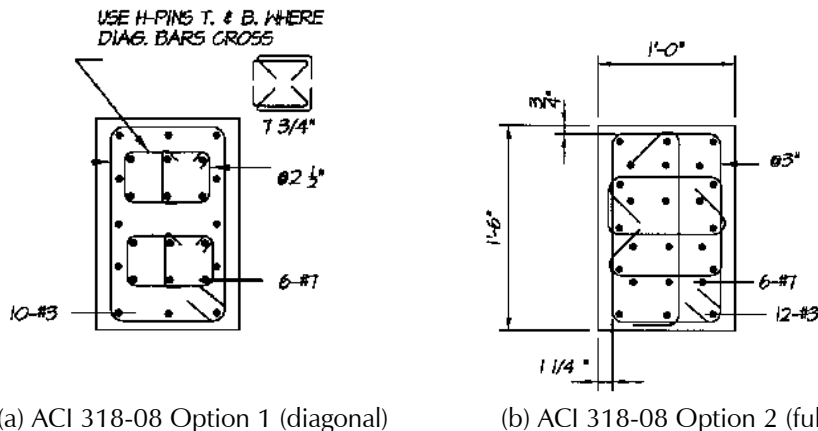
Coupling beam reinforcement detailing (Wallace, 2007).
